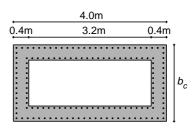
The hollow rectangular section for the pier column: 4m wide in the transverse direction,  $b_c$  width in the longitudinal direction and an all around concrete thickness of 0.40m.
